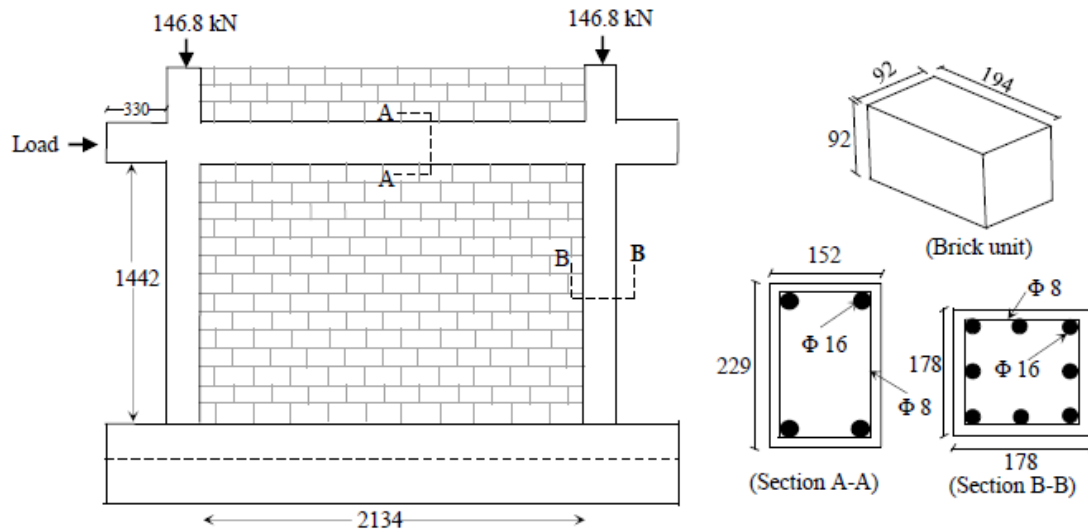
Geometric details of the selected infilled frame available in Mehrabi et al. (1996) with RC section details and brick dimensions (dimensions in mm).
